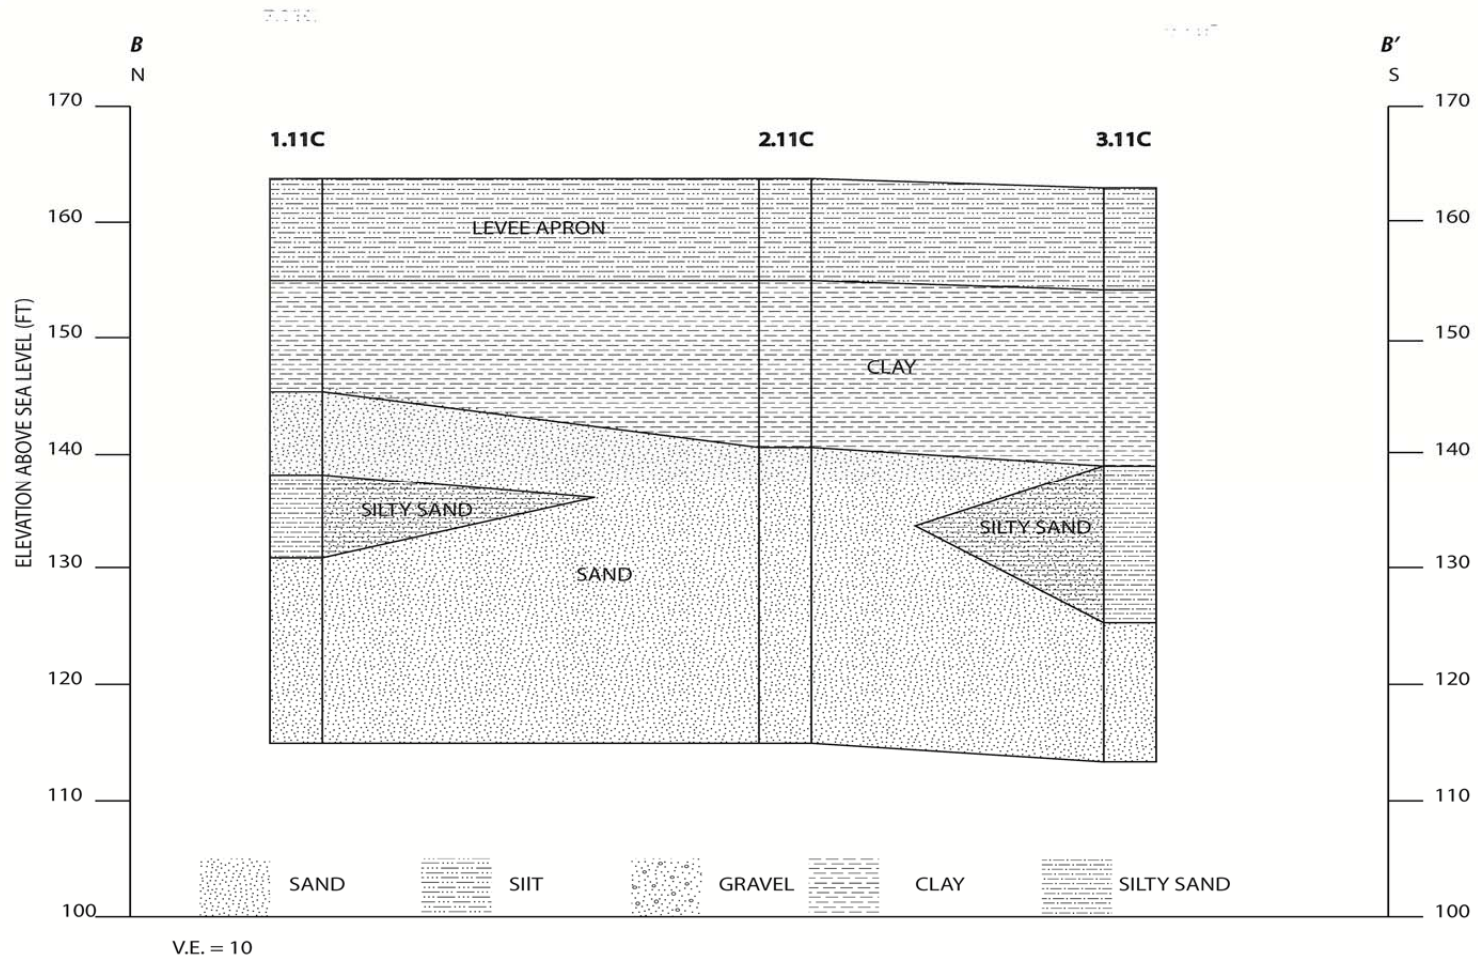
Cross-section B-B' shows a pinching out of the silty-sand towards borehole 2.11c.
